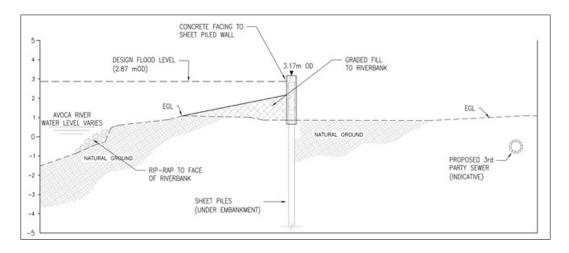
Section through sheet pile with RC cap. Not to scale.
